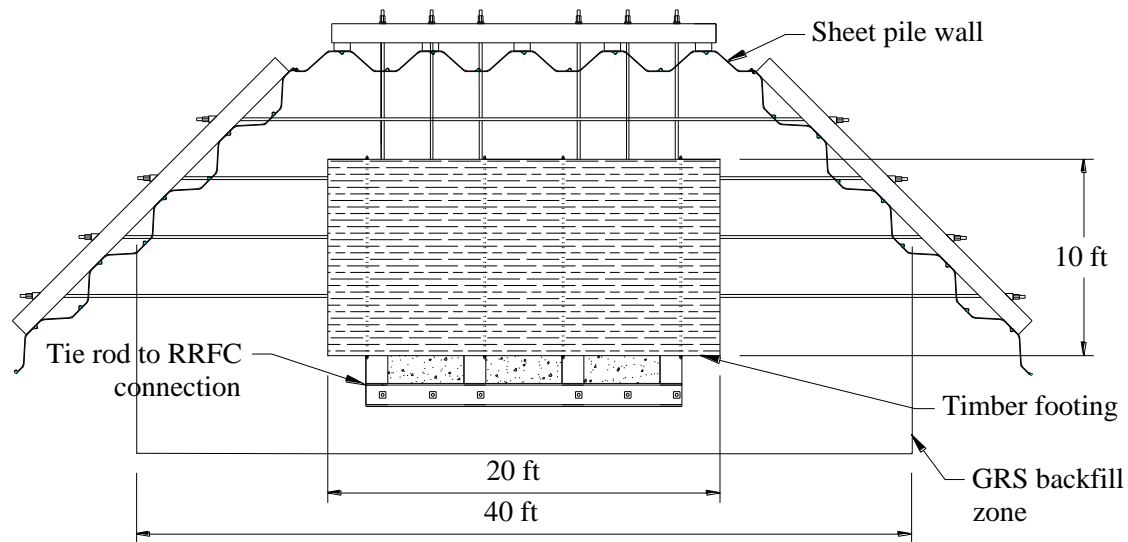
Design detail plan view of TC, Iowa sheet pile abutment and backfill retaining system for demonstration project (superstructure not shown)
